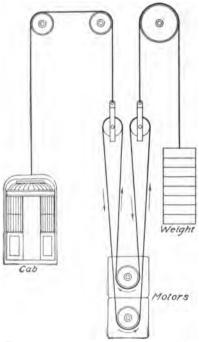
Diagram of Fraser Elevator Driving Mechanism
